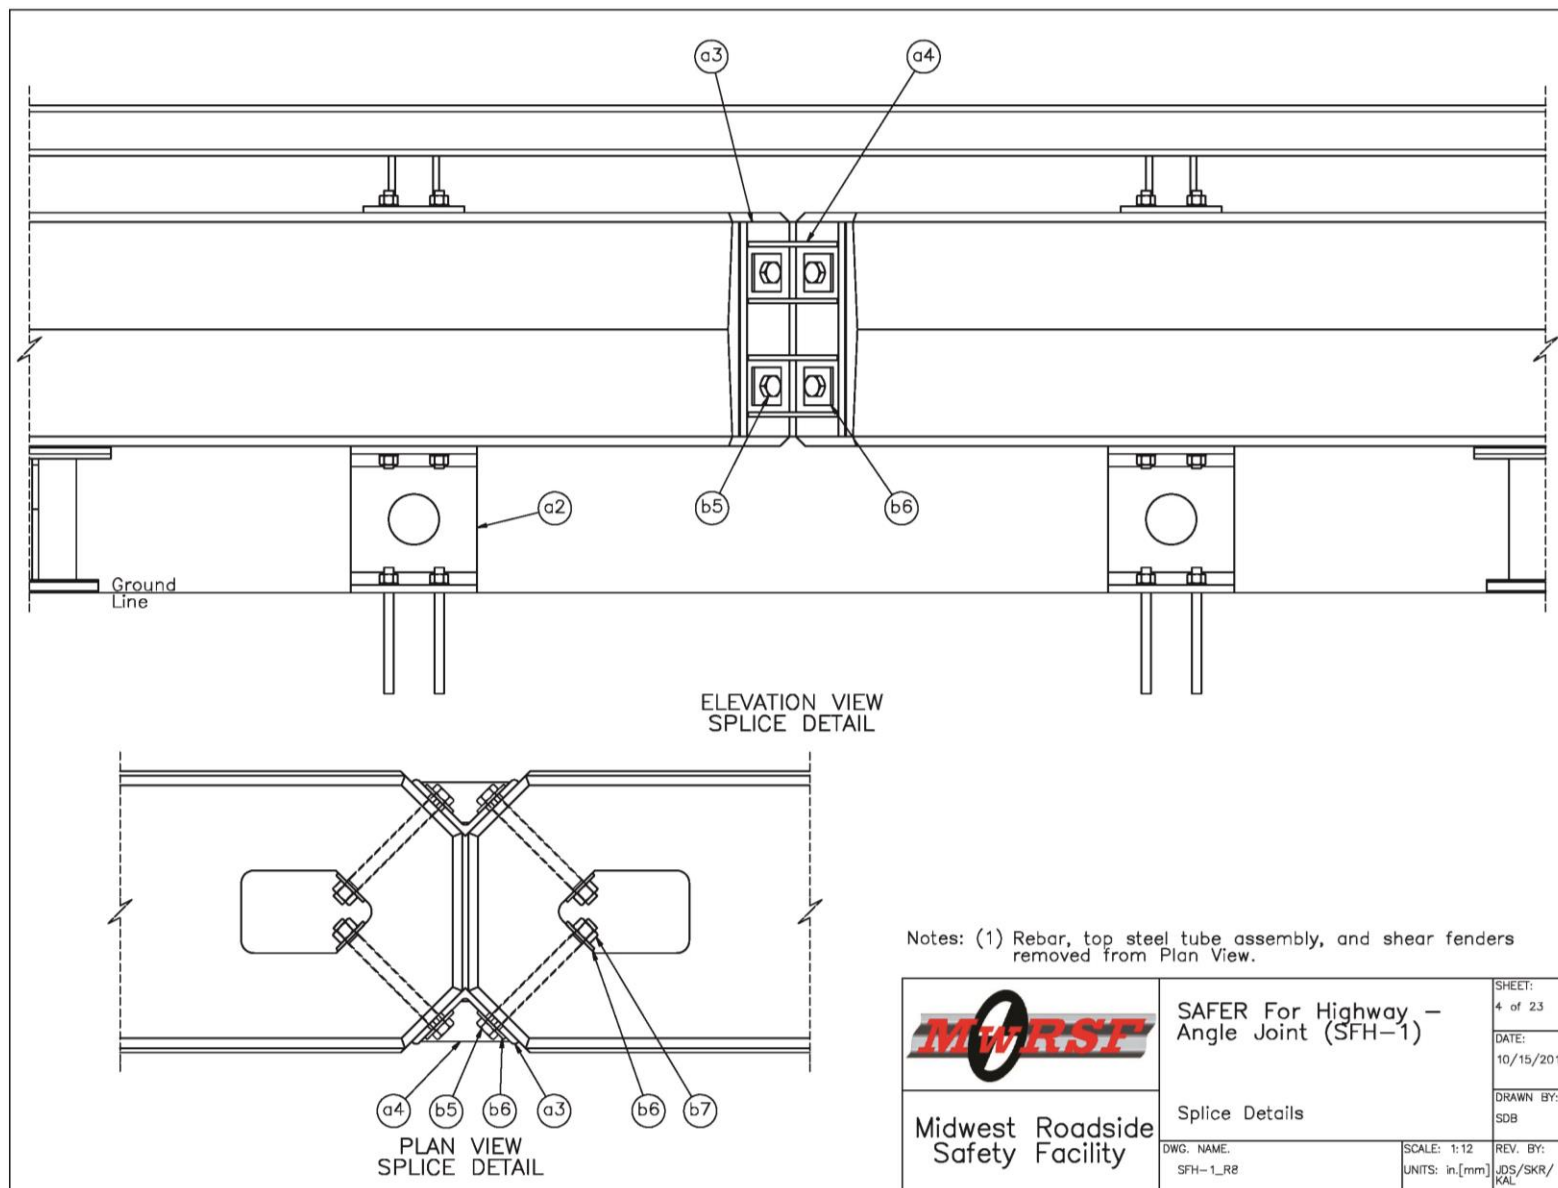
Recommended Barrier Design for Full-Scale Crash Testing, Splice Details
